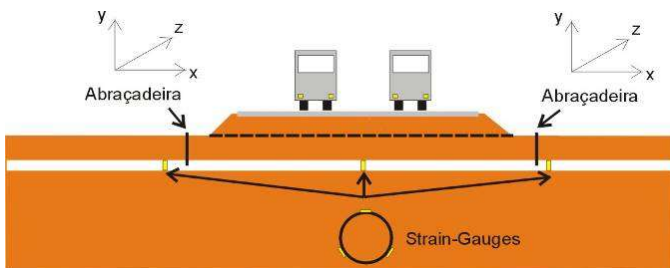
PROPOSED INSTRUMENTATION AT NEW INTERSECTIONS.
